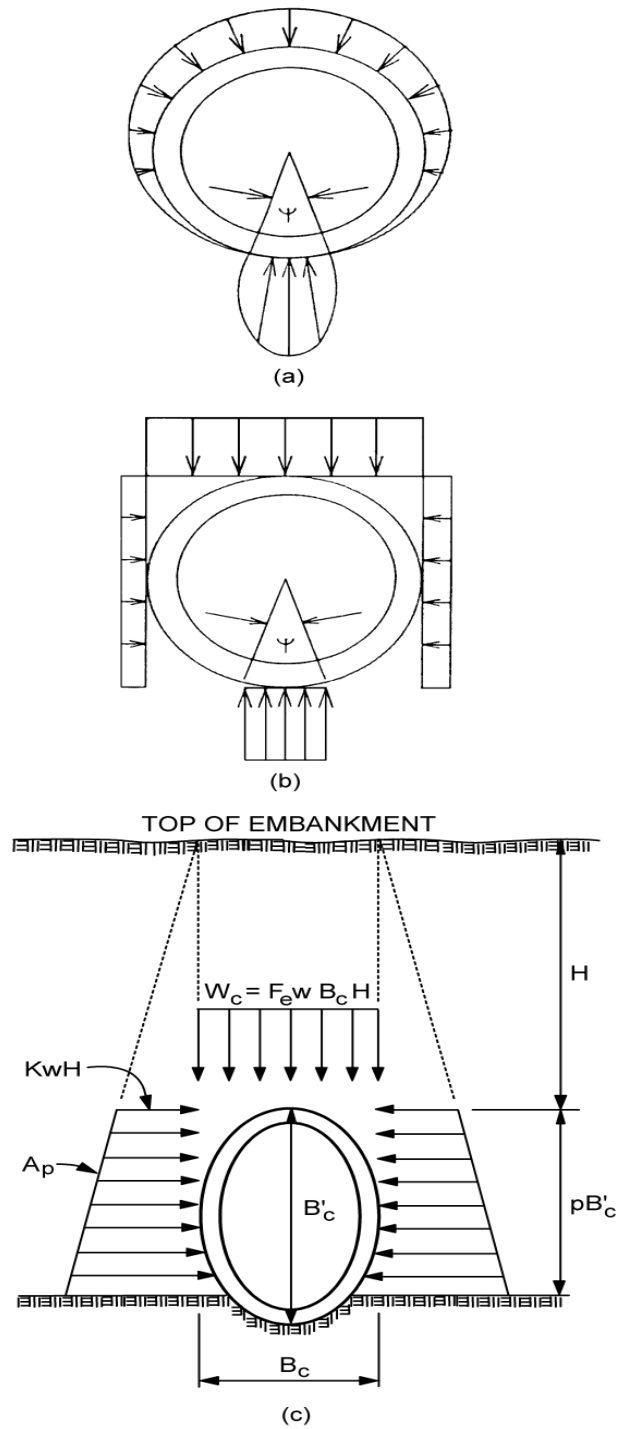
Suggested Design Pressure Distribution around a Buried Concrete Pipe for Analysis by Direct Design
